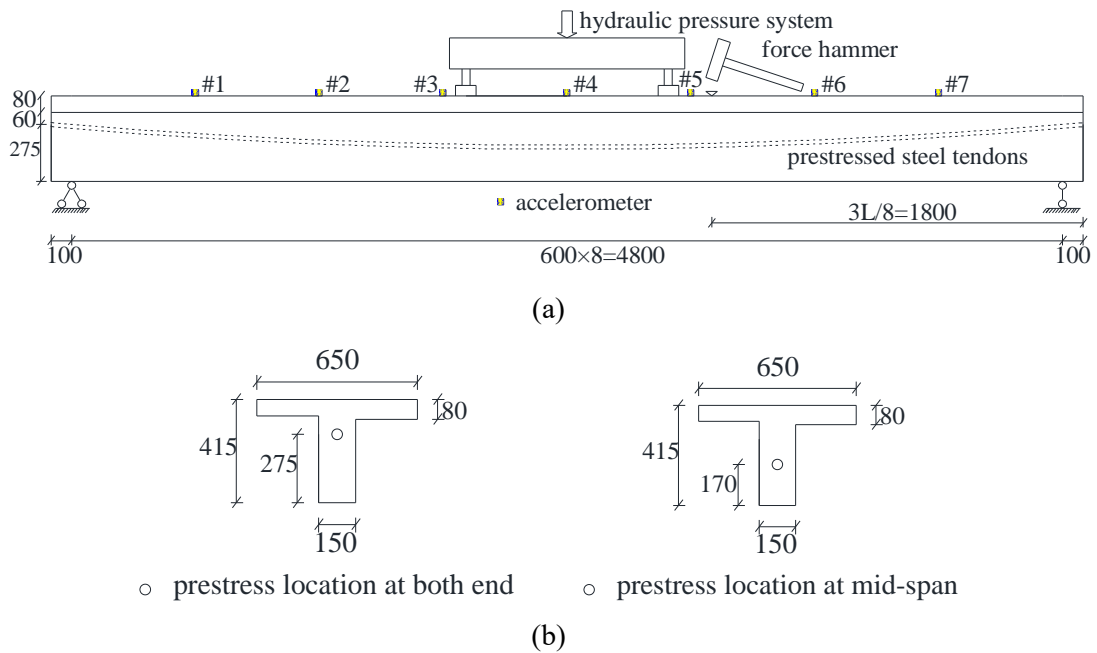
The sketch of pre-stressed concrete beam: (a) plan view; (b) cross-sections. (unit: mm).
